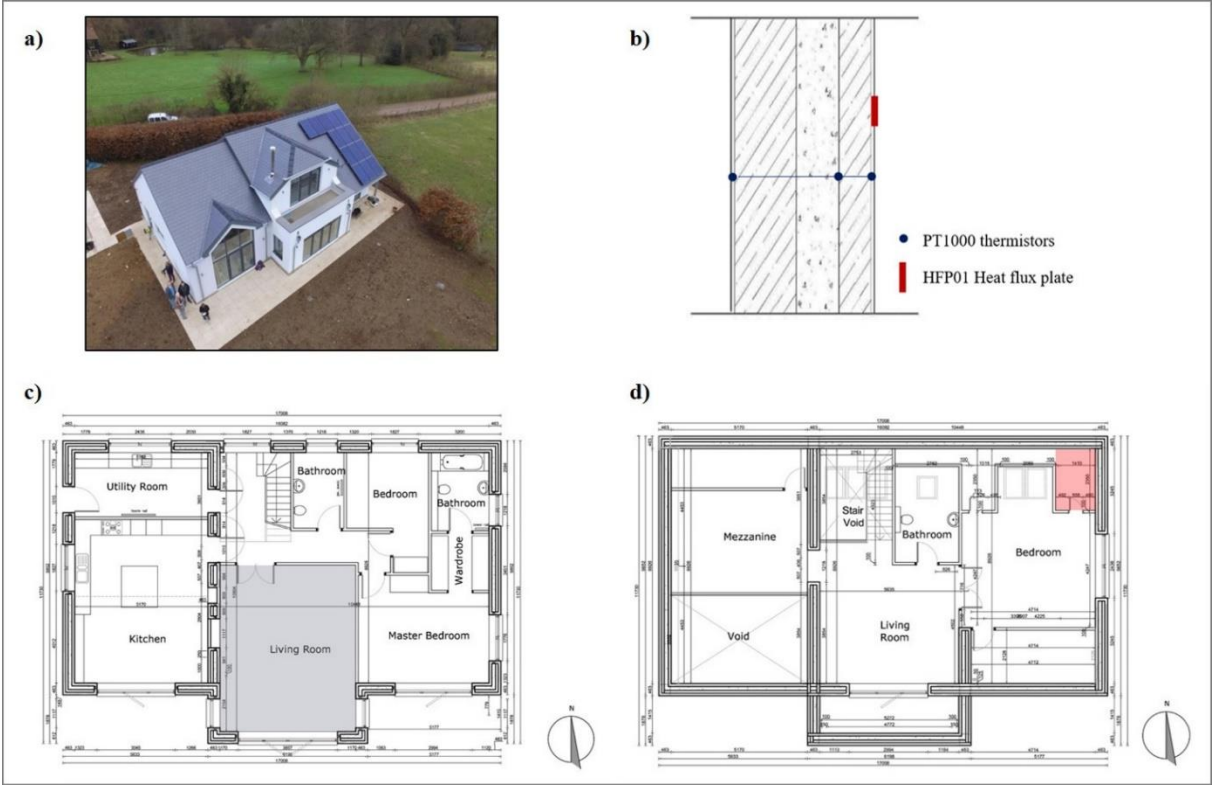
The case study building: a) South-West view of the building, b) Cross-section of ICF wall showing location of the surface temperature and heat flux sensors, c) Ground-floor plan and d) First-floor plan of the building.
